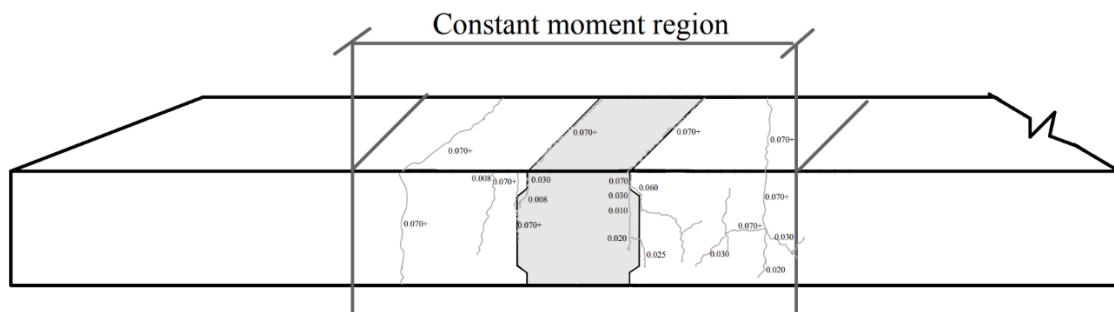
Crack Propagation for Proprietary Short-Term Specimen at 90 % of Final Load
